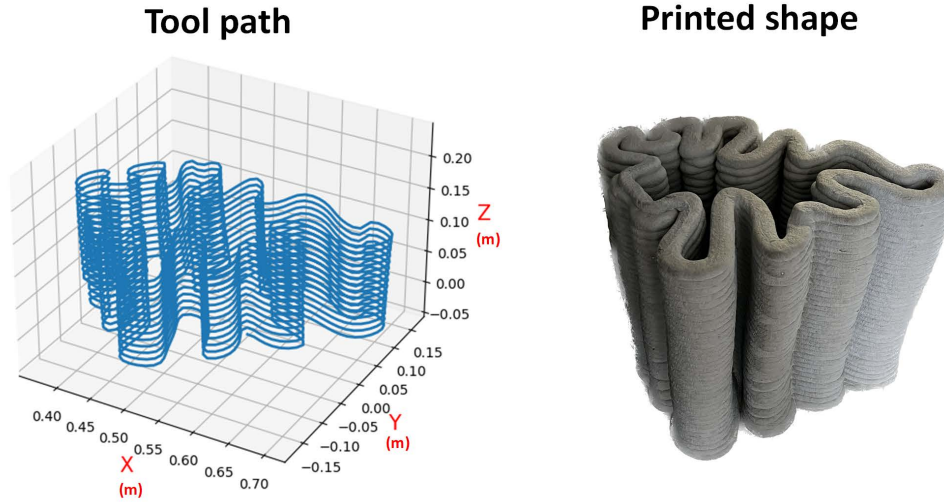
Printing a complex shape: toolpath generated by slicing and the final printed shape.
